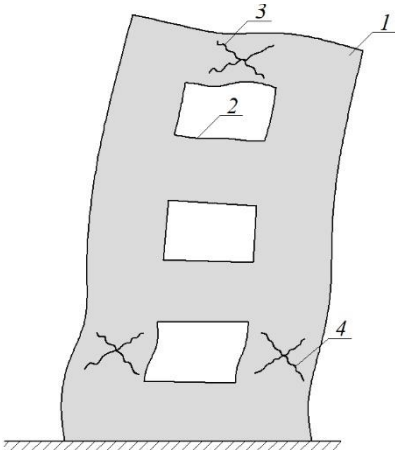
Deformation of structure: 1 – stiffening wall, 2 – window opening, 3 – diagonal tension cracks in spandrels, which can occur at the top or other elevations, depending on the vertical shear distribution, 4 – diagonal tension cracks in piers which can occur at the bottom where horizontal shear is the largest
